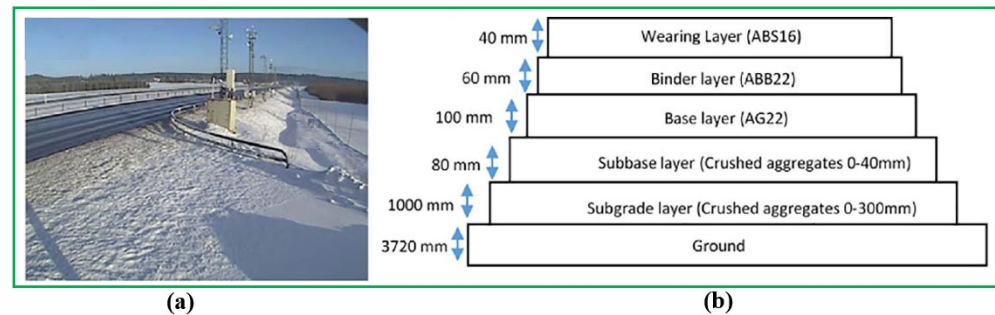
Test site: (a) actual photo; (b) pavement layers [32].
